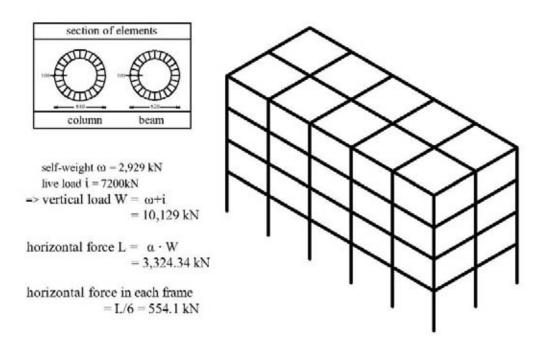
loading scheme of the construction model made of wooden tube
